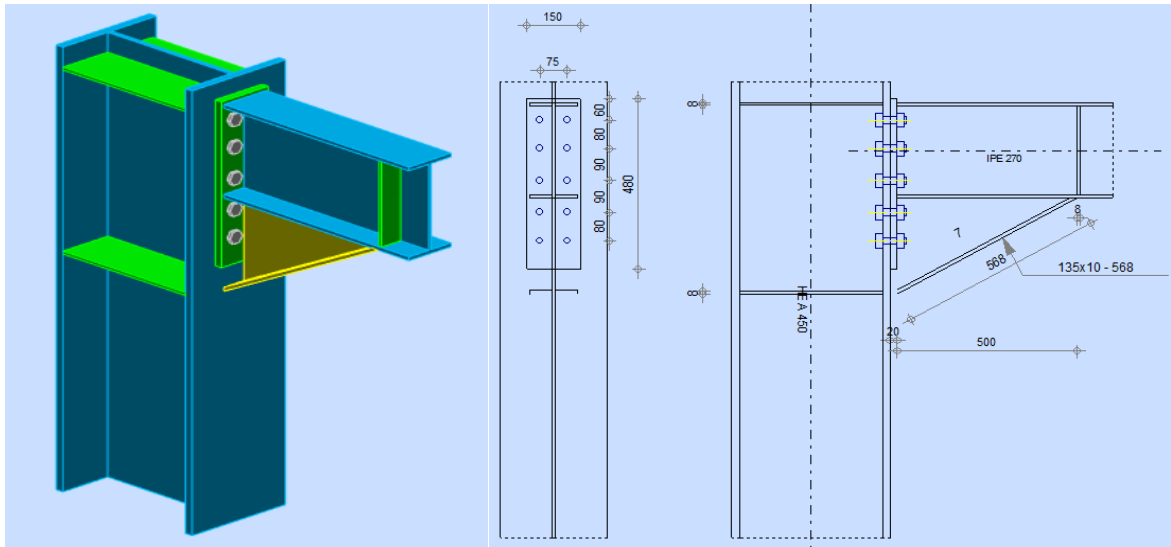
Beam IPE270-Column HEA450 connection.
